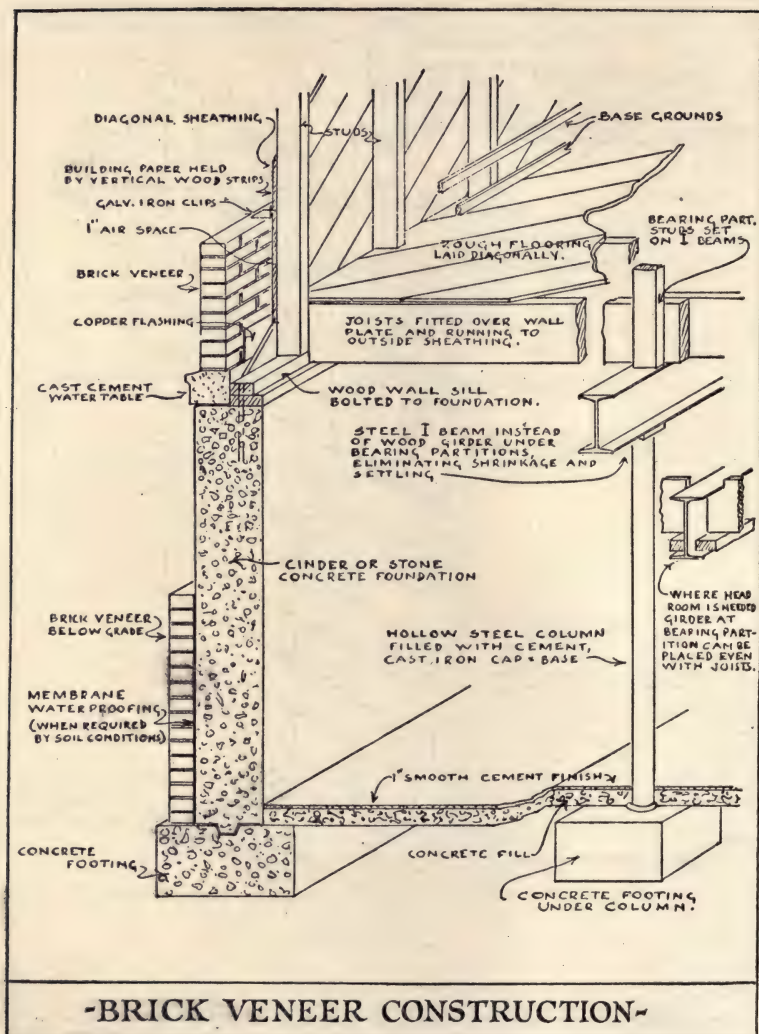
Where brick veneer construction is used, it is important to provide air space between sheathing and brick, also to insulate against air leakage due to shrinking of the wood construction at all windows and doors. Brick veneer on the outside of waterproofing on foundations is a wise protection.
